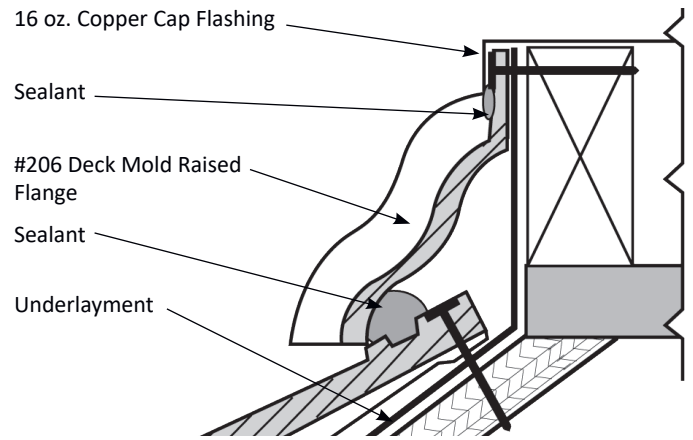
Deck Section with #206 Deck Mold Raised Flange
